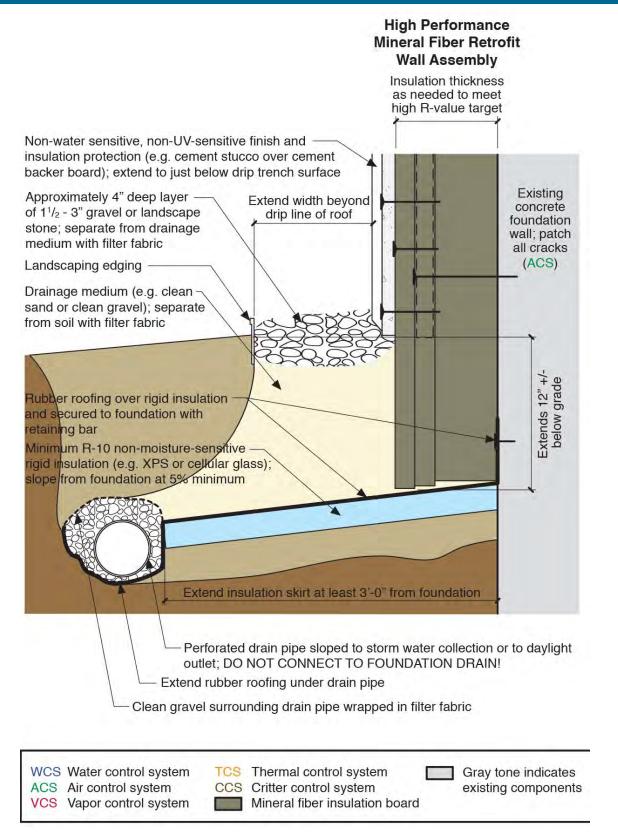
Insulated ground roof included with mineral fiber retrofit foundation wall approach
